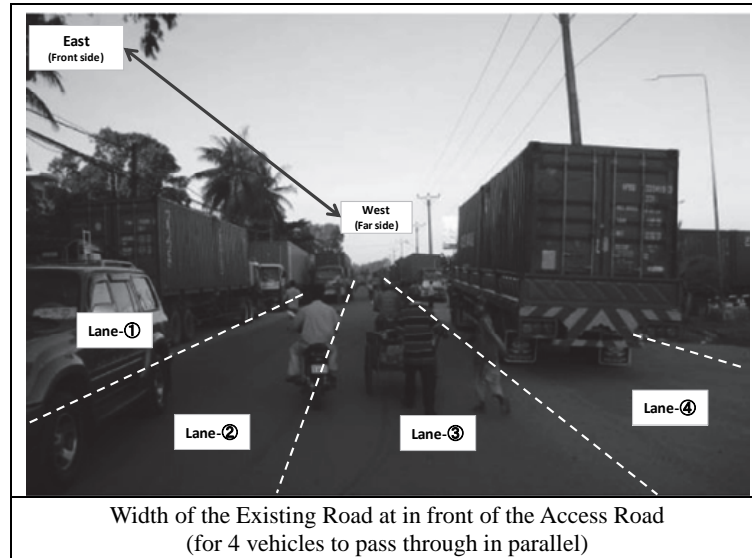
Proposed location to develop a parking/wating space around Sihanoukville Port
